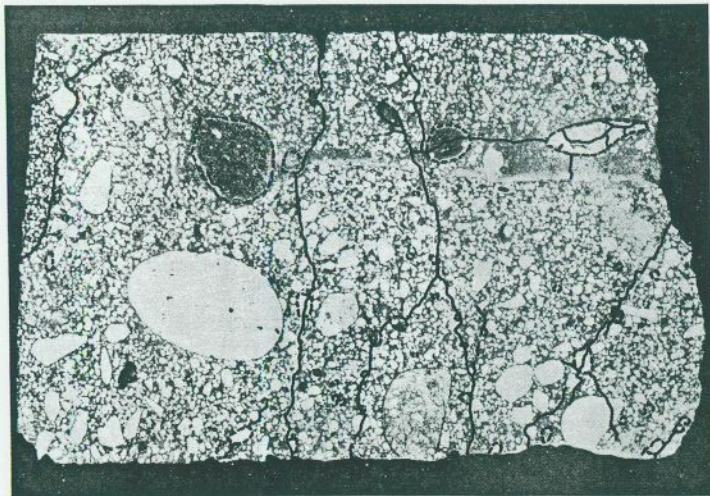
Large pebble of dense, pigmented flint, in thin section of concrete from exterior wall of bascule pier below water level, Oddesund Bridge. The traversing main-crack is lined with gel, an unusual phenomenon among the writer's observations on alkali-aggregate reaction. The gel has possibly seeped into the crack from another reacted pebble. From (3971). Thin section No. I-44-[54.5.101]. ○.
